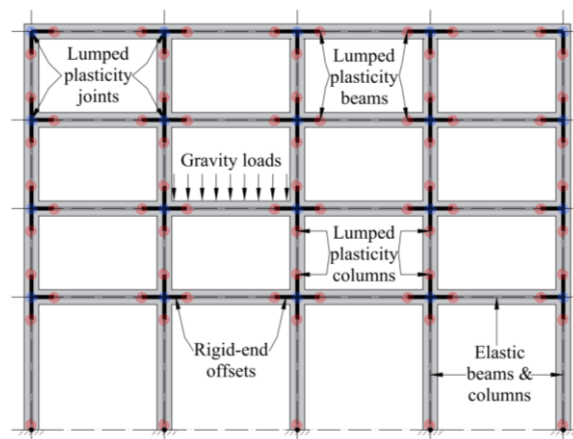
Geometric layout and nonlinear modelling strategy of the case-study frame.
